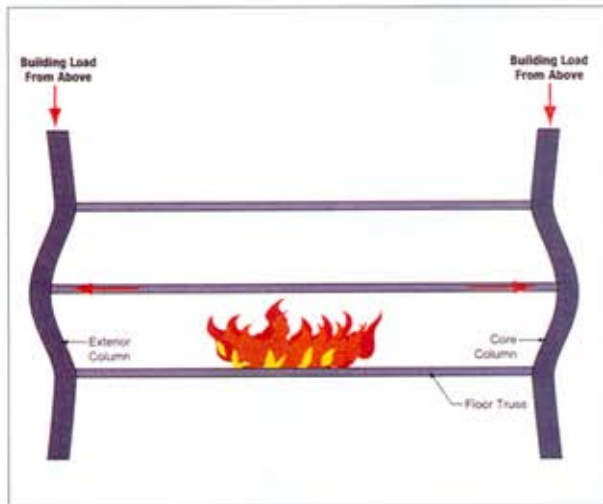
(Far right) Expansion of floor slabs and framing results in outward deflection of columns and potential overload.
